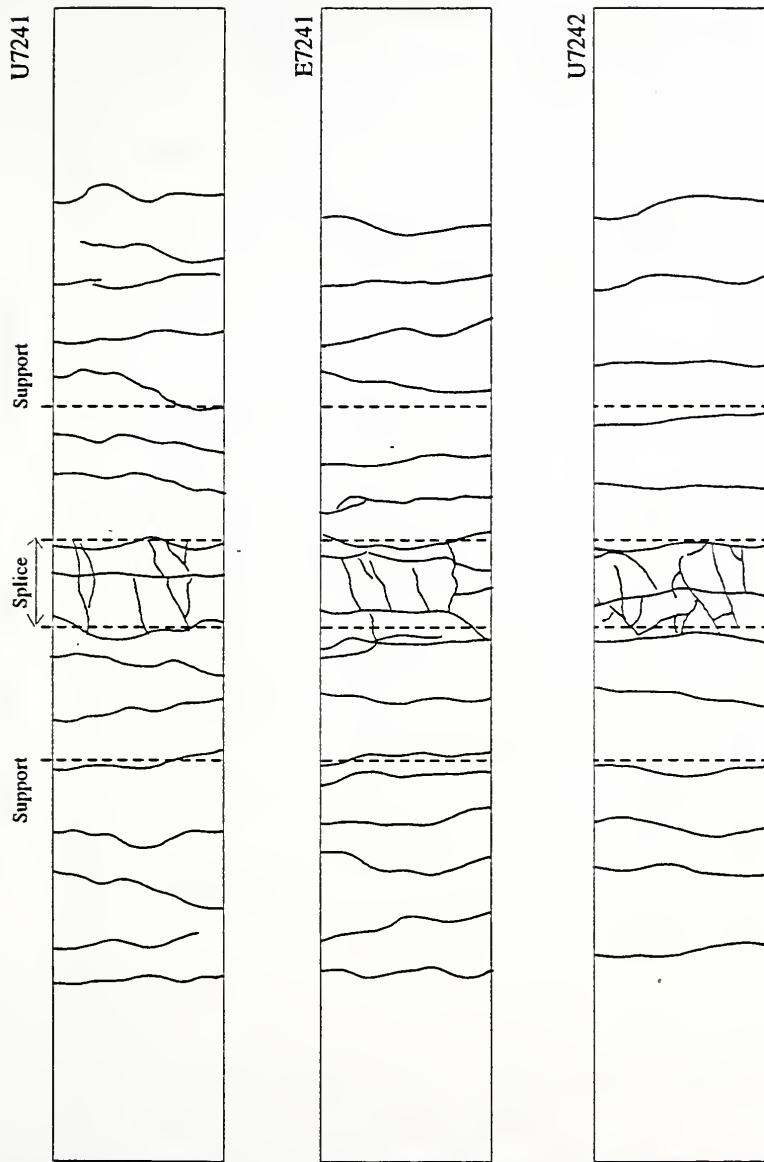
Crack Patterns at Failure, Type A Specimens
